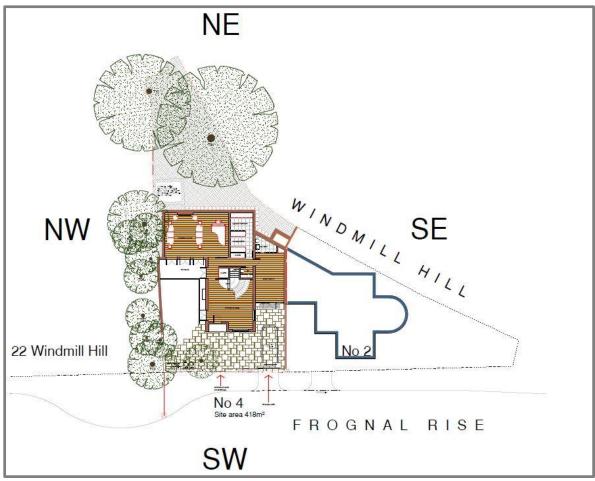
Proposed Site Plan - 4 Frognal Rise, London, NW3 6RD
